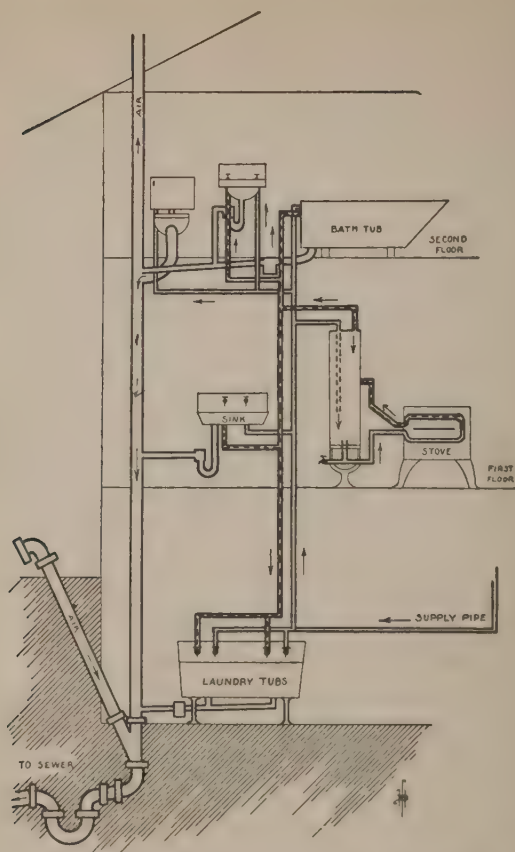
This is a plan of a simple water system in a house. Trace the path of cold water from the supply pipe to laundry tubs, kitchen sink, range boiler, bathtub, washstand, and toilet. Now trace the path of hot water from the heater in the stove to bathtub, washstand, kitchen sink, and laundry tubs. Trace five branch drainpipes to main sewer pipe.
